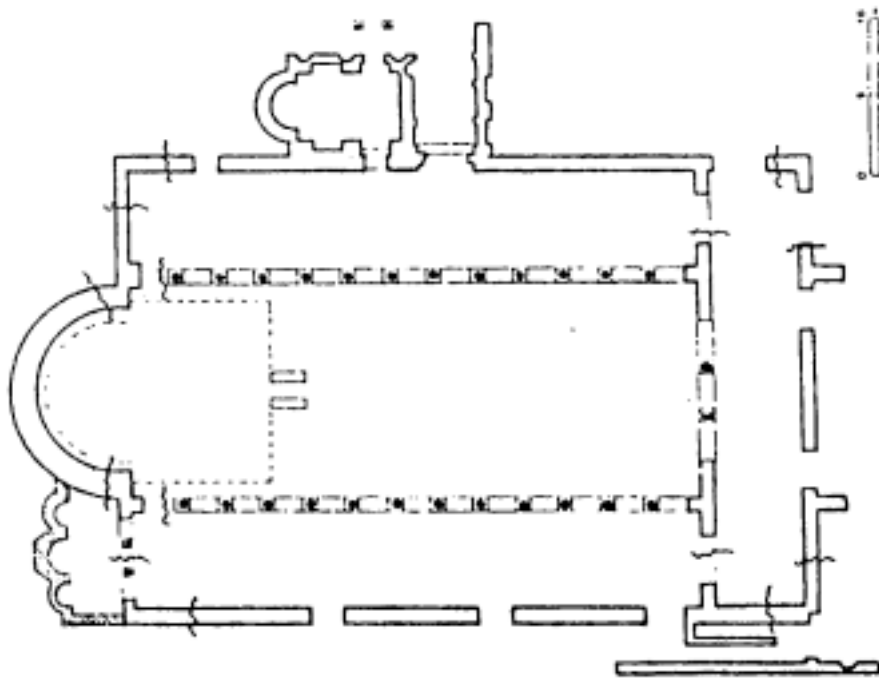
Plan of the Church showing the regions of the main vertical cracks
